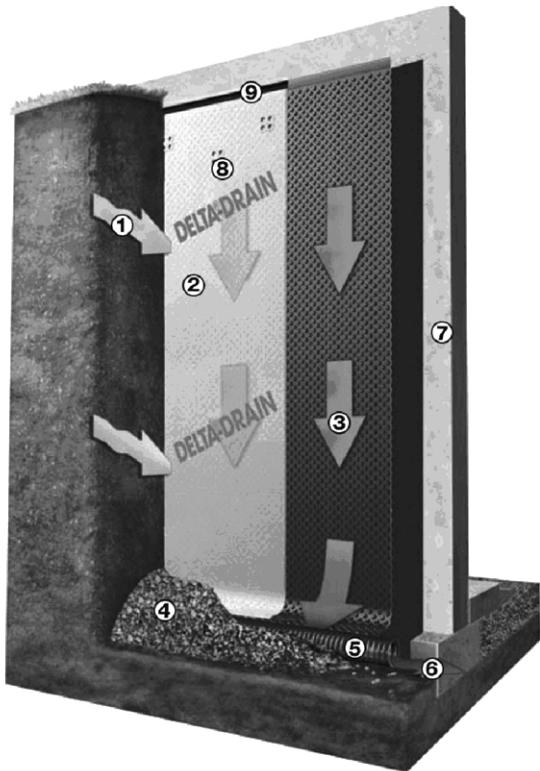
Typical installation of the product on a foundation wall with the geotextile fabric placed against the soil:
